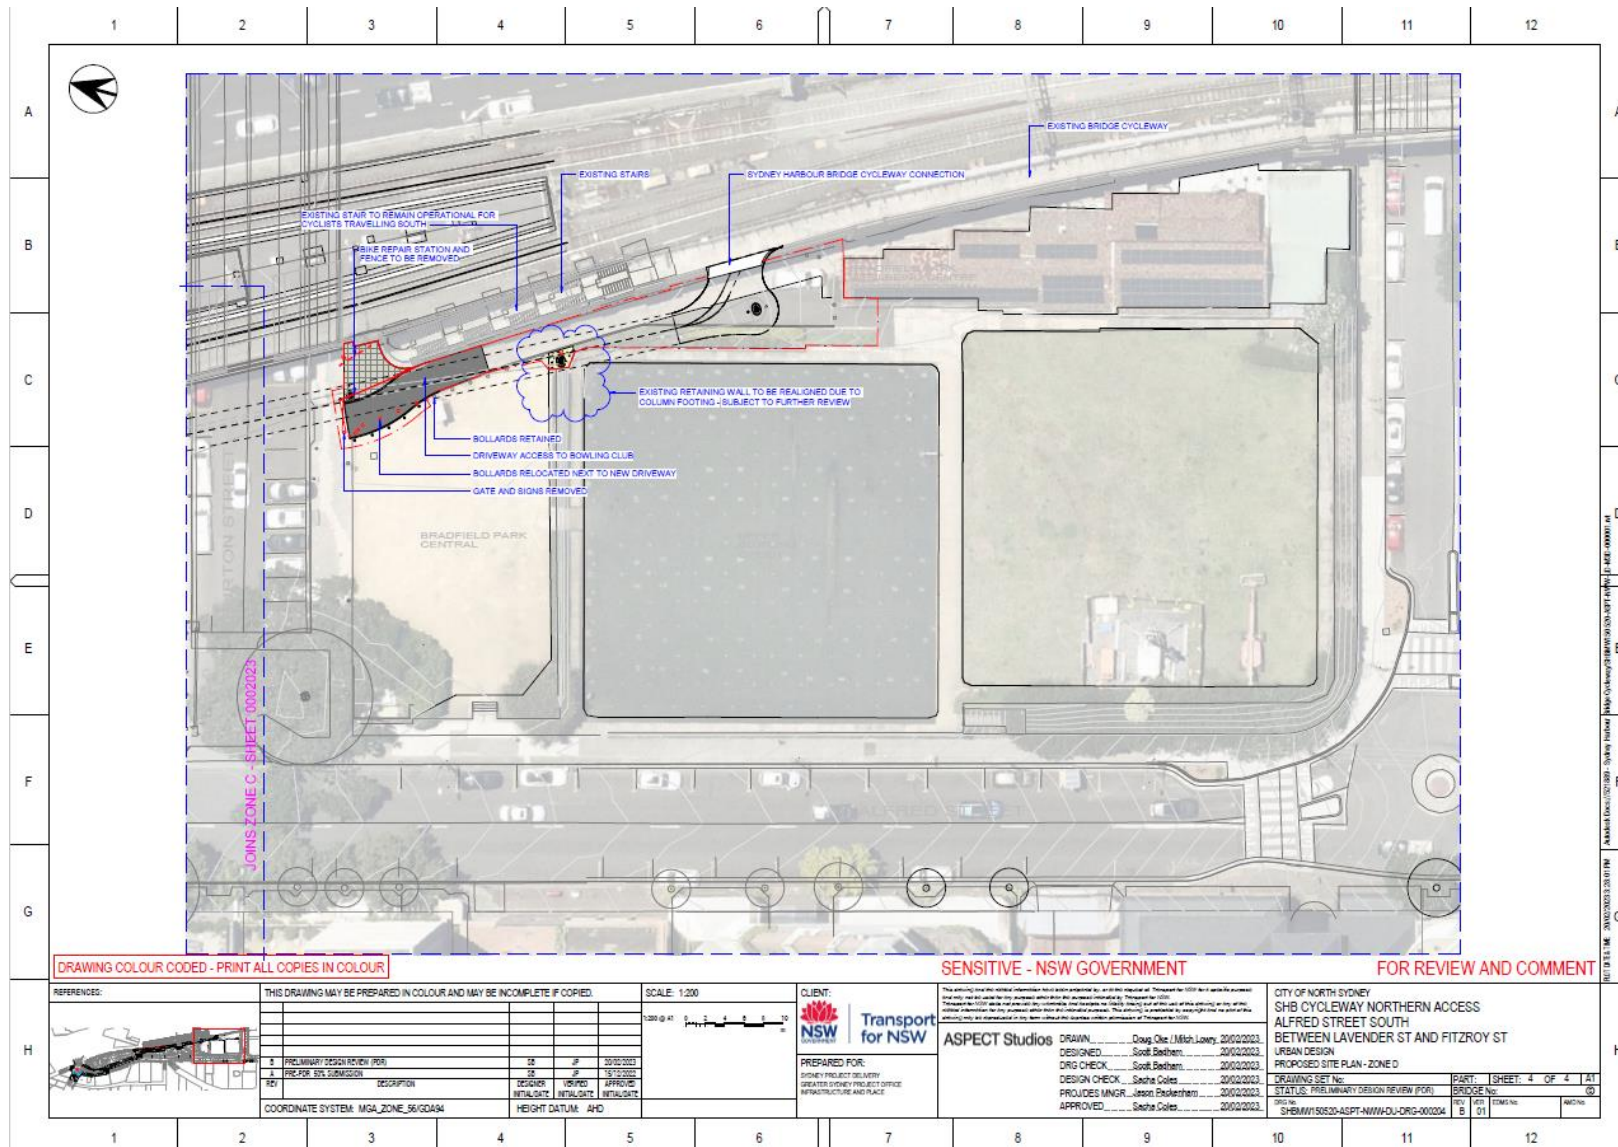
Proposed Site Plan – Zone D (Source: Aspect, 2023)
